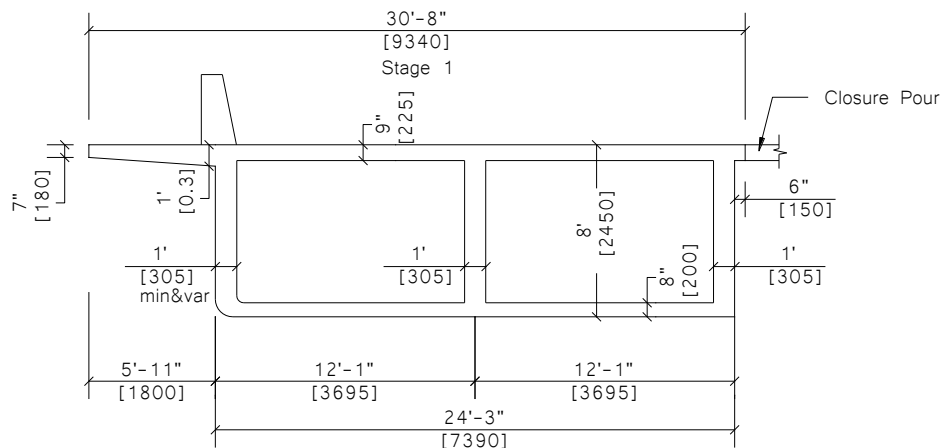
Cross-sectional details of Frame 1, Bridge 3
